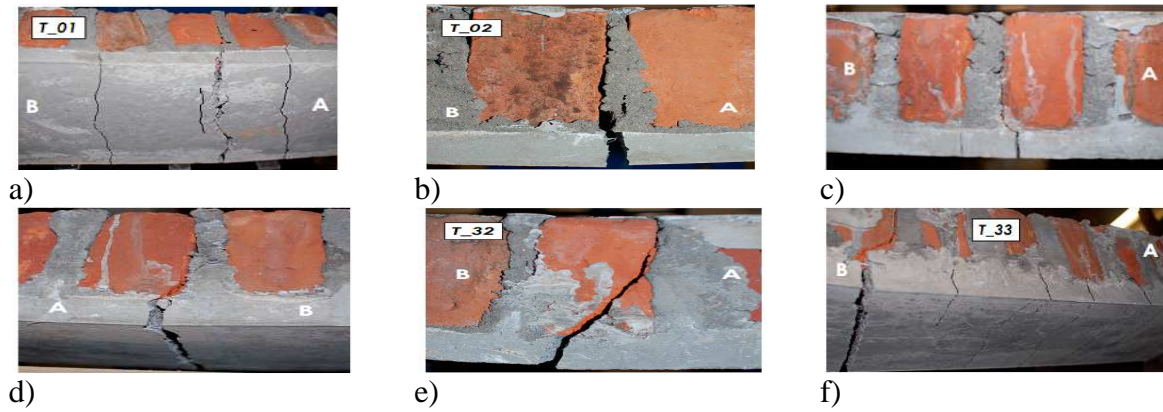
Flexural crack pattern for SFRCC strengthened specimens
